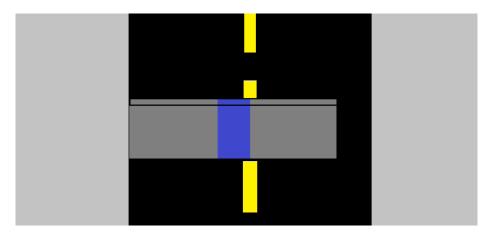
Illustration of flood wall blocking a road, but standard sizes elements does not cover the entire road
